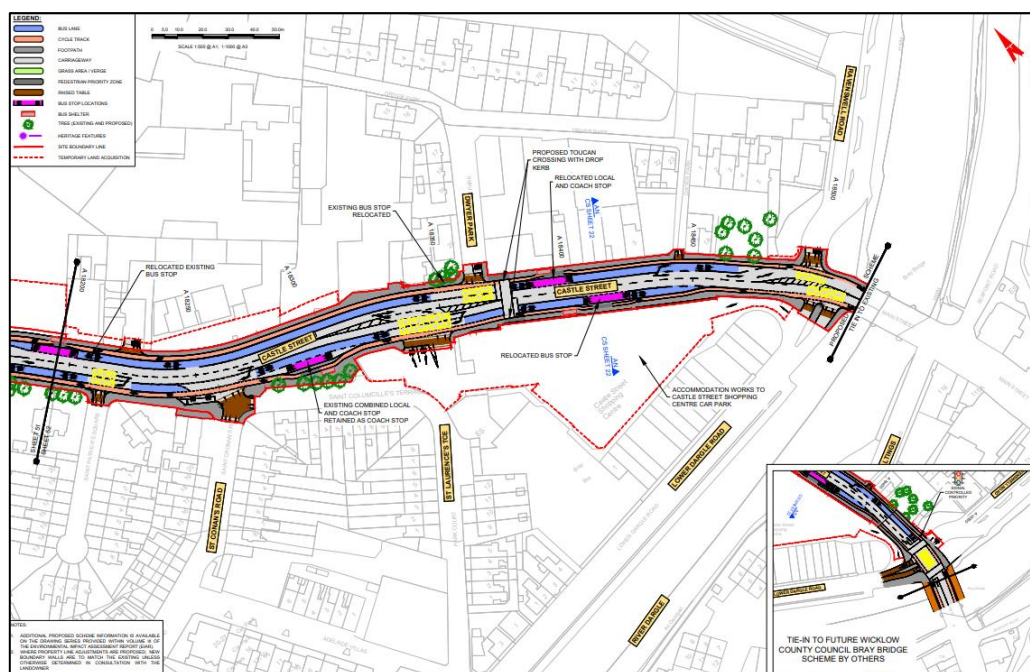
Extract from General Arrangement Drawing at Castle Street (Sheet 52)
